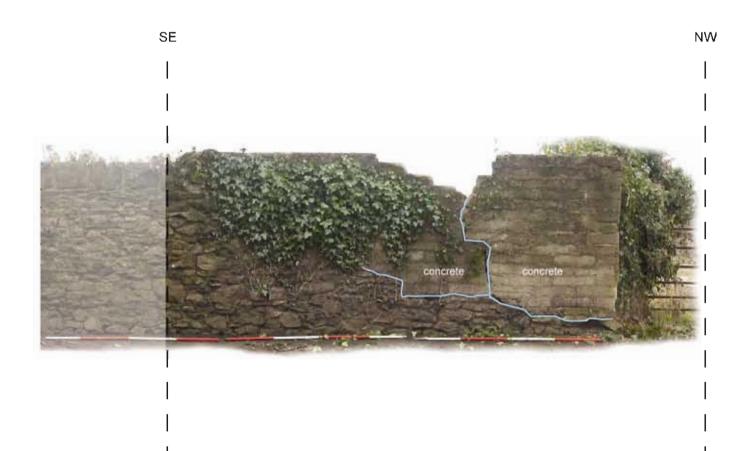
Advance Archaeological Test Trenching of Metro North: Testing Area 6, Lissenhall Little and Balheary Demesne townlands, Co. Dublin, RPA ref: (MN101) Lissenhall to Fosterstown Townland boundary wall HC#414: Northeast-facing elevation, Detail D.
